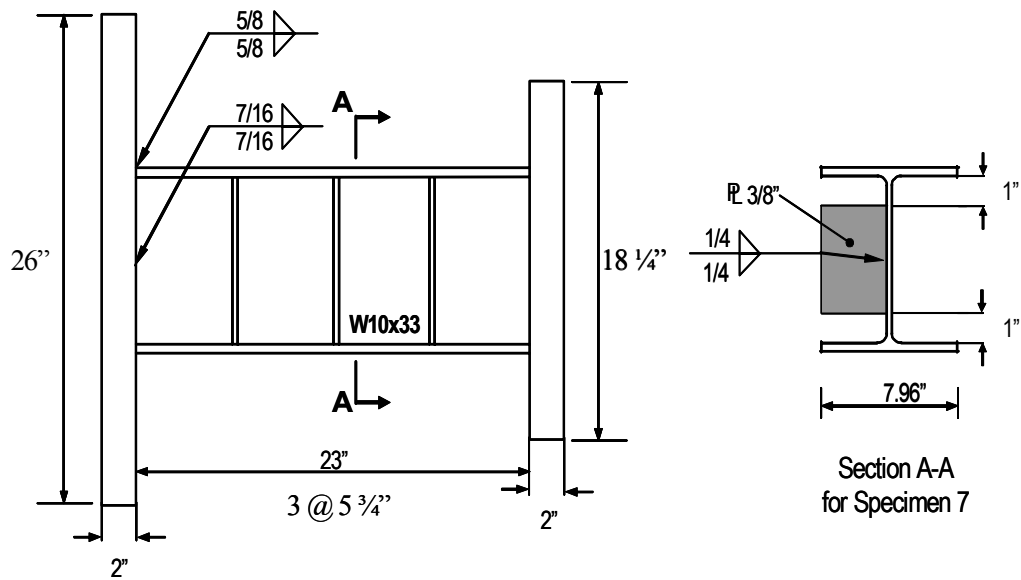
Welding and stiffener details for Specimen 7
